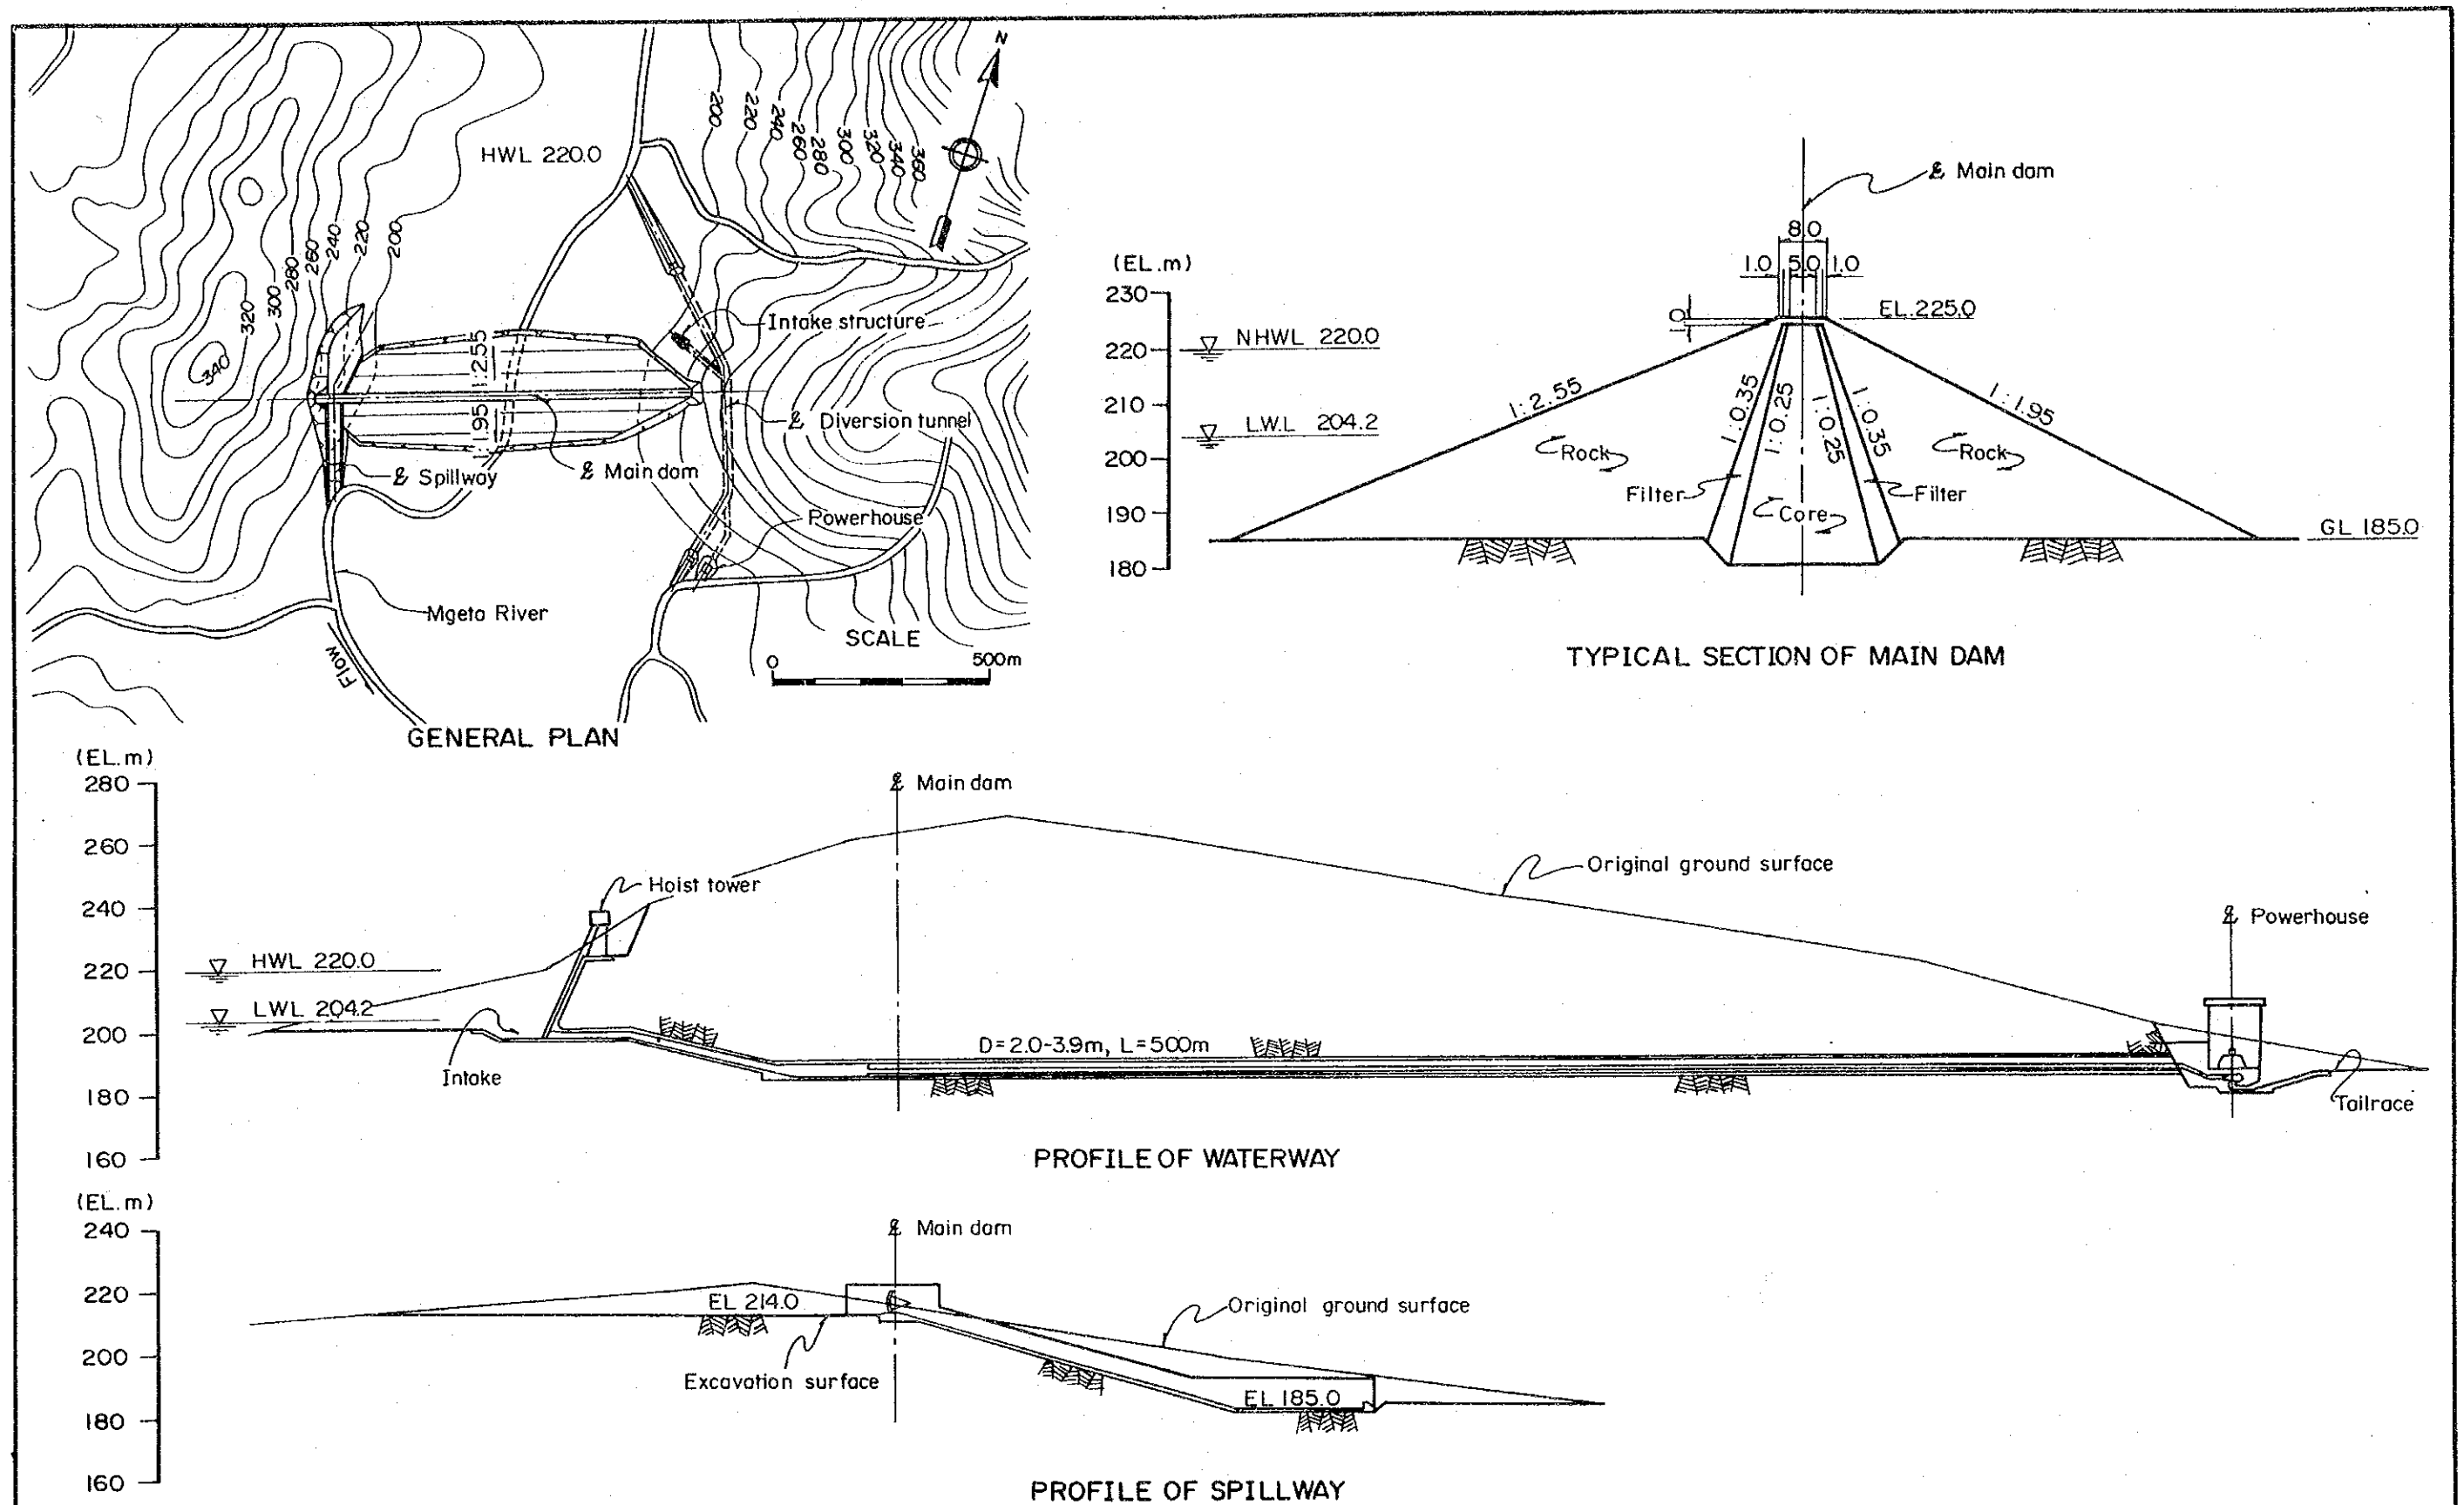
LAYOUT PLAN OF MGETA DAM PROJECT
